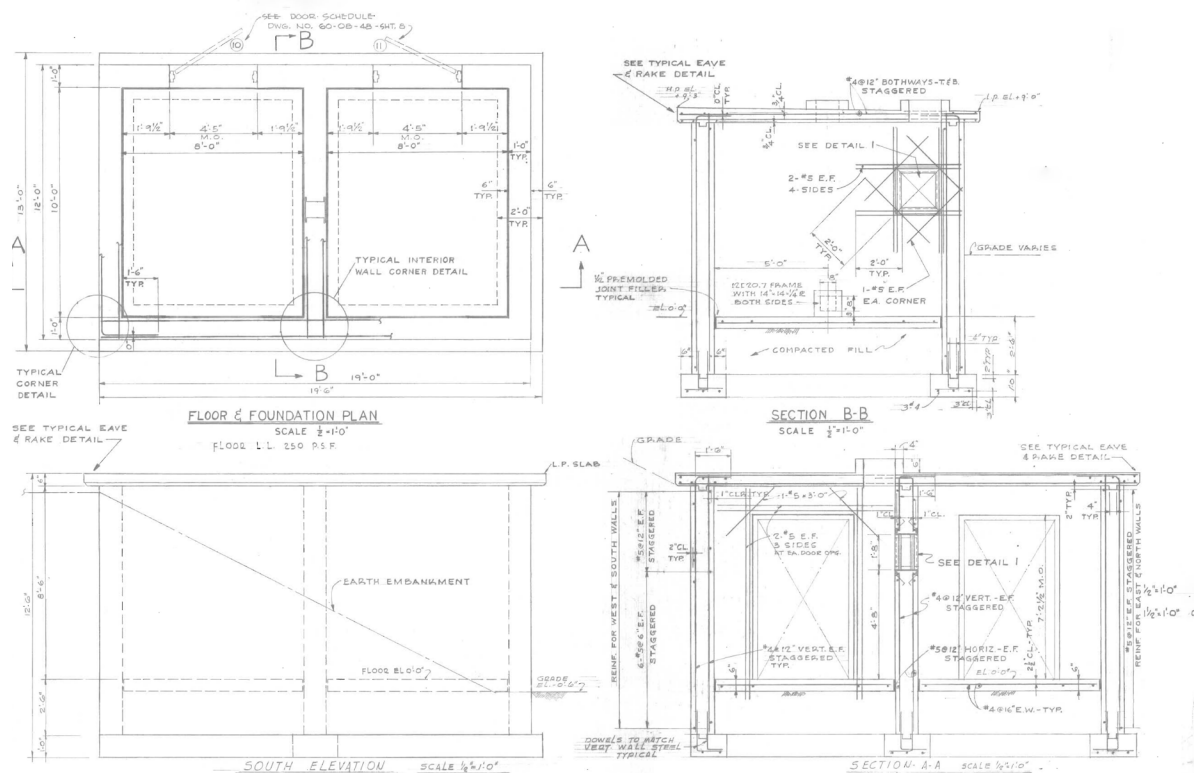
Property 23660 plan, section, and elevation drawings from WS-IA plans.
